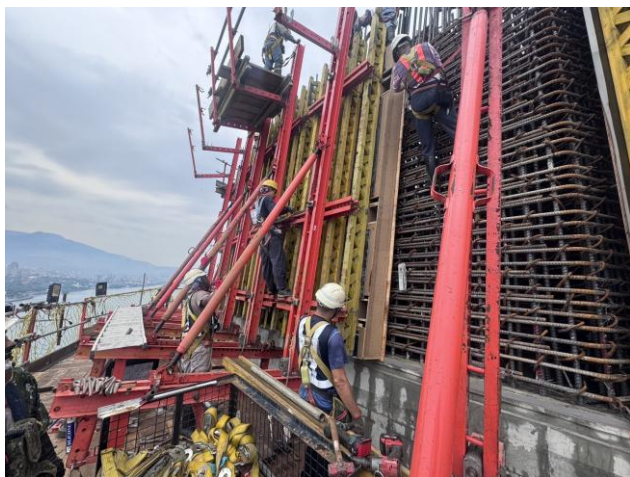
Wall Formwork VARIO+3D Boxes adapt to the outside radius changing from convex to concave at Level 91 (U26)
